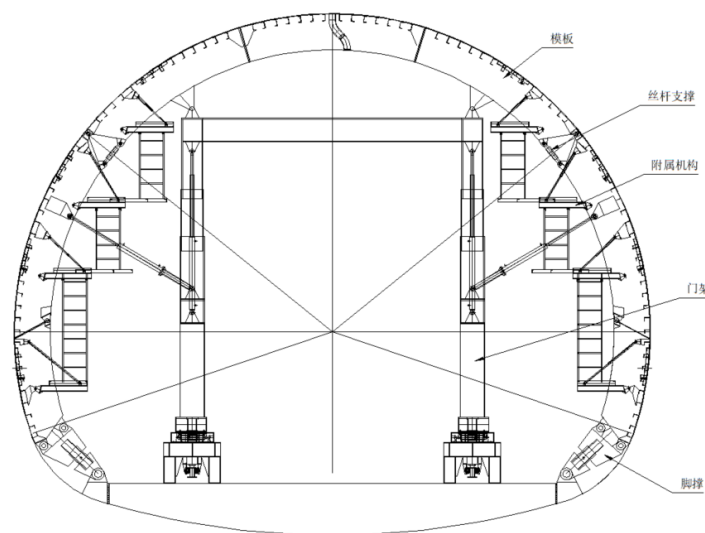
Overall scheme of the traversing type secondary lining trolley without framework (Translation from left to right: Template; Screw support; Auxiliary support; Door frame; Foot support)
